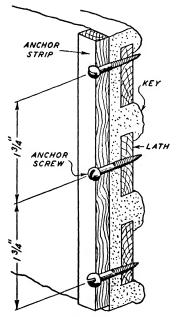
Wall Construction Showing Method of Supporting Plaster When Cutting Opening for Outlet
